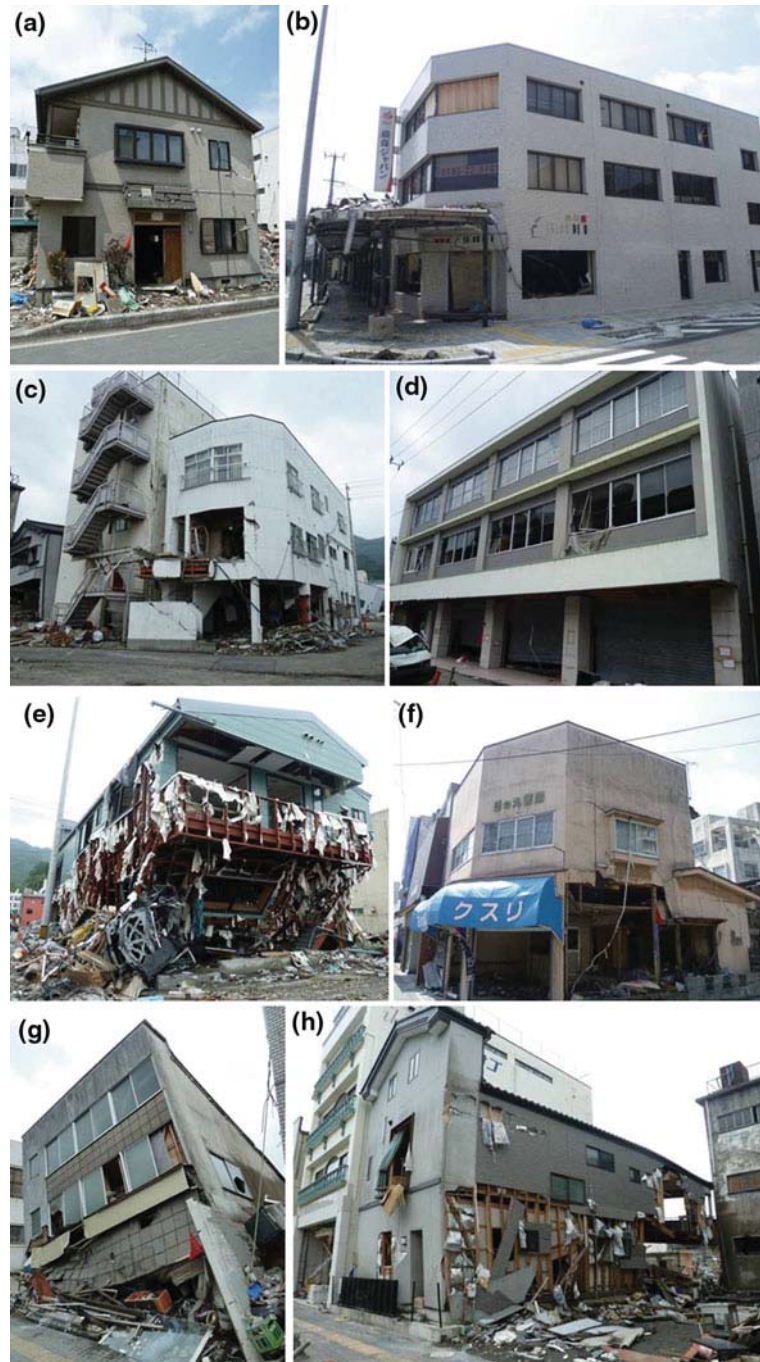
Photographs of structures surveyed in Kamaishi City, providing examples of the EEFIT tsunami damage scale applied for different structure types: a Timber frame structure, observed damage level D1; b Steel frame, D1; c Steel frame, D2; d RC shear wall, D2; e Steel frame, D3; f Timber frame, D3; g Timber frame, D4; h Timber frame, D4. The position of each photograph is indicated on Fig. 3 by the photograph letter
